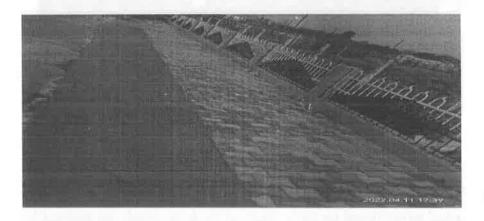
Renovation work on the premises of the Collector office at Janjgir-Champa.
